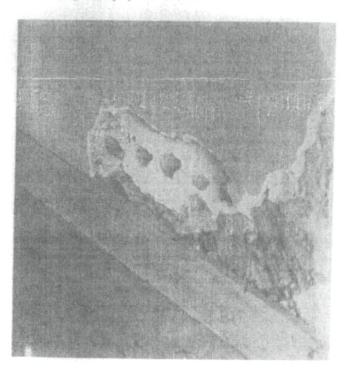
The builders of this mid-18th century house installed the baseboard moulding first, then applied a mud and horse hair plaster (called paling) to the masonry wall. Line was used for the finish plaster. Also shown are the backing marks which prepared the wall for a subsequent layer of plaster. Photo: Kay Weeks
